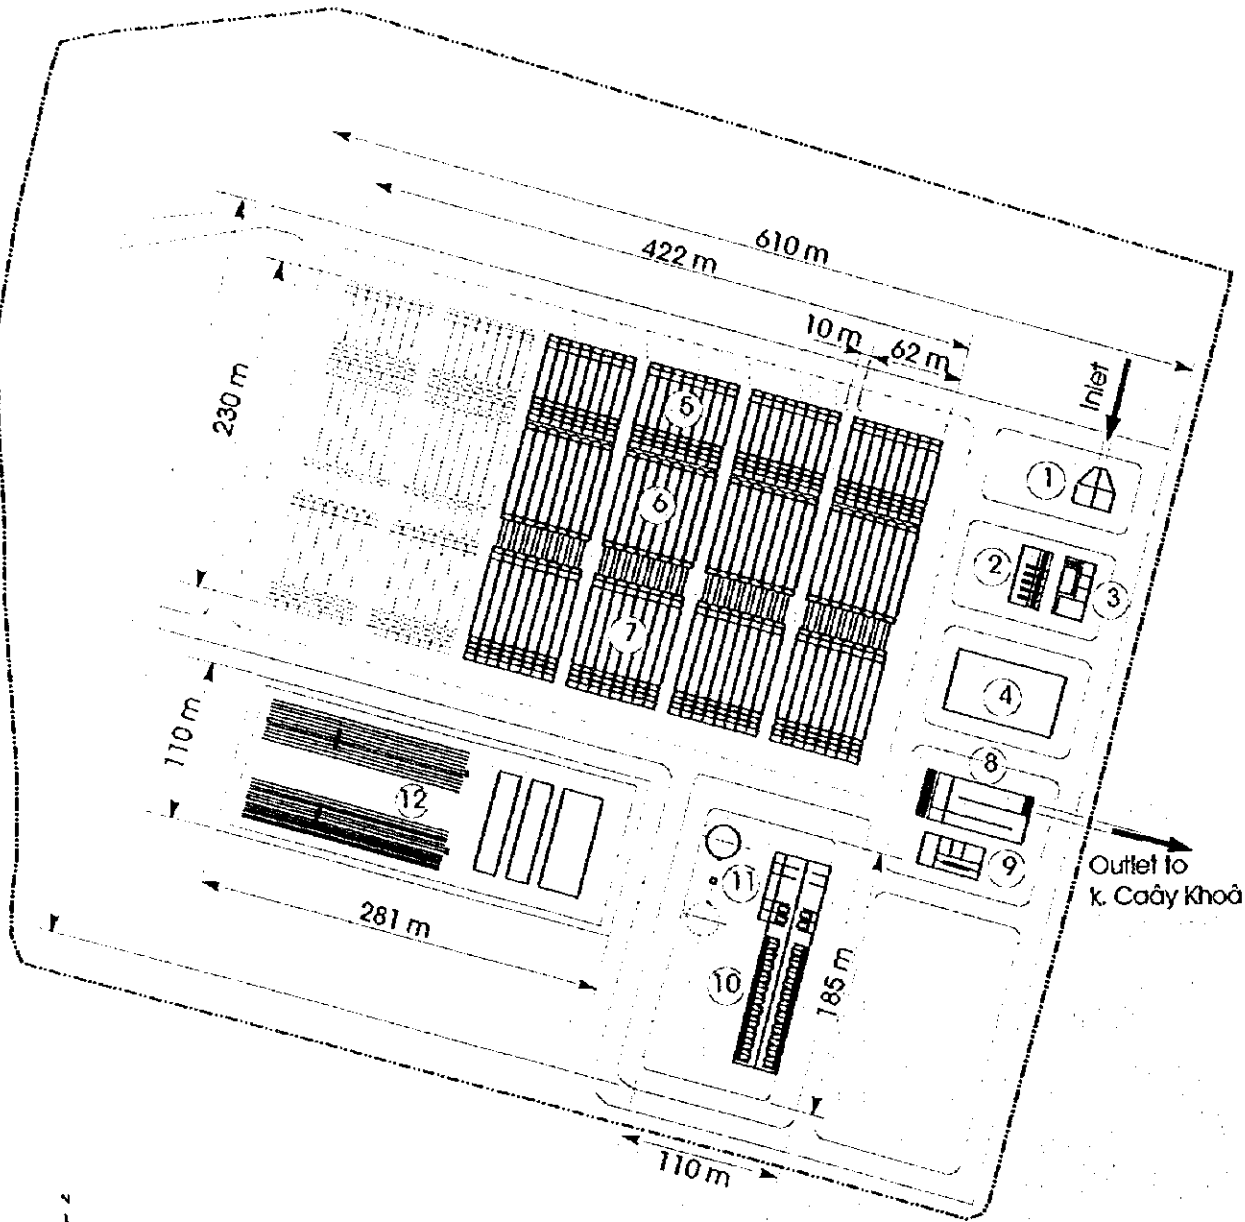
PROPOSED LAYOUT OF WASTEWATER TREATMENT PLANT
